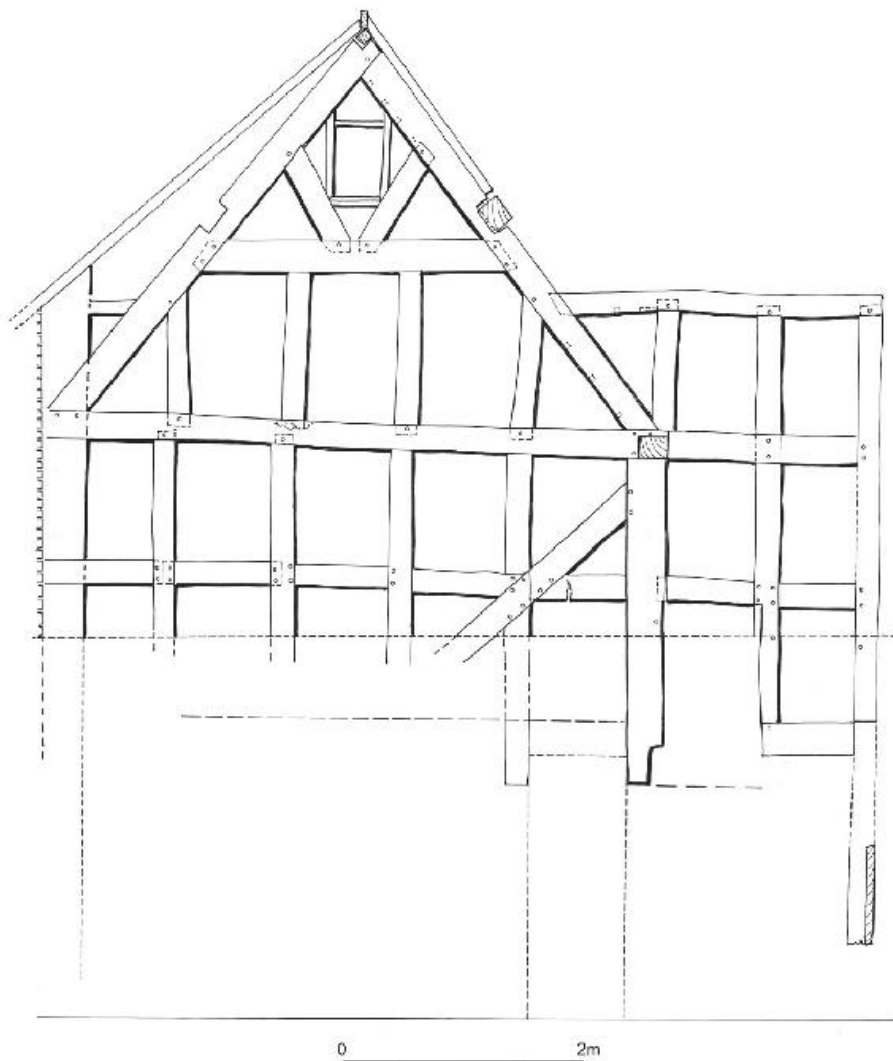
Part survey of the east gable-frame of Wyebridge House and its junction with the side-frame of the adjacent stair turret
